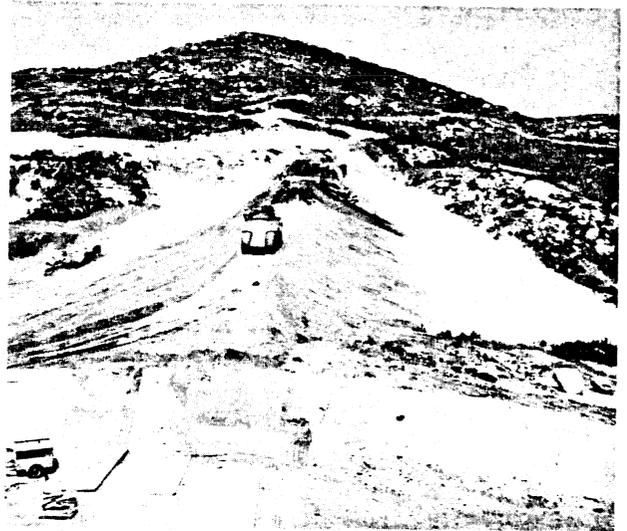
Constructing crest of earth dam (spillway control structure in foreground)
